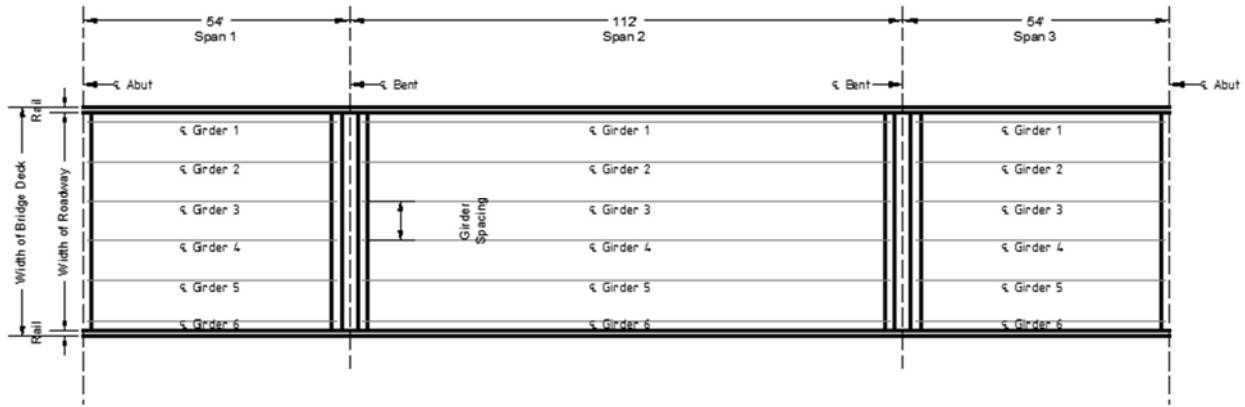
Top View of the 0 Degree Skewed ITBC with Spans and Girders
